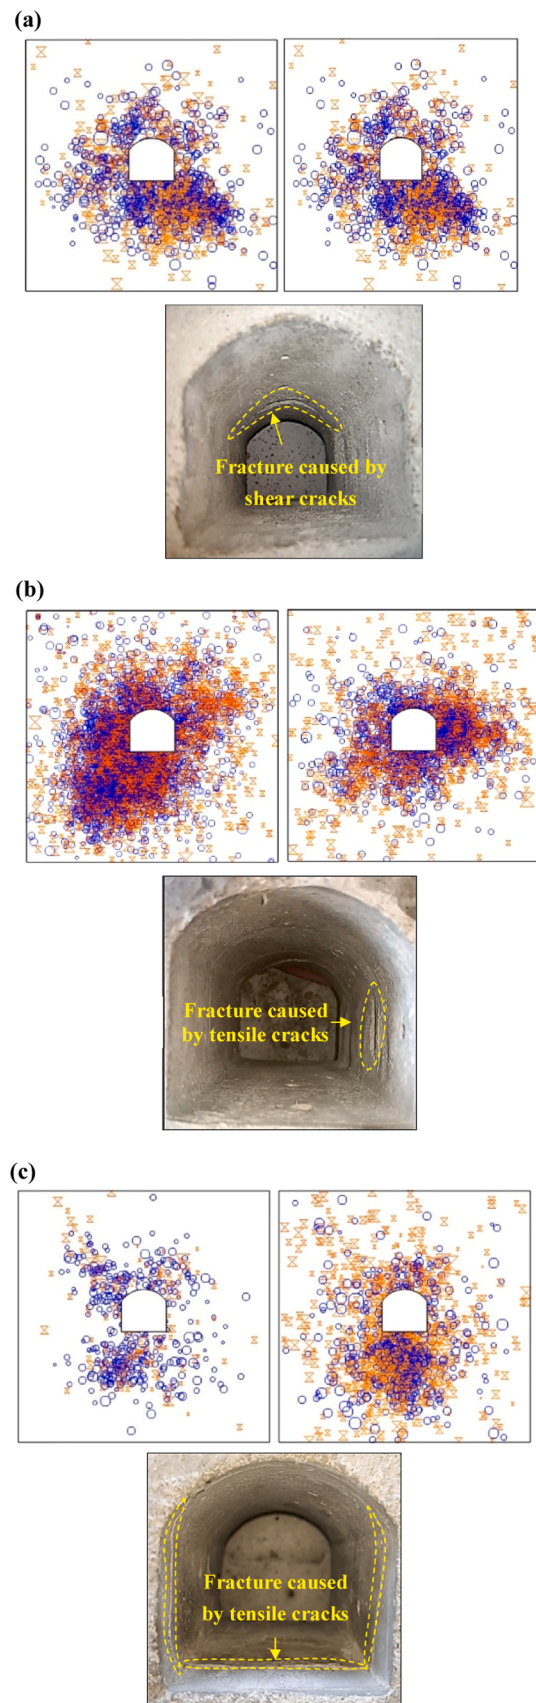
Failure mechanism of tunnel under different blasting disturbance directions: (a) Roof; (b) Right sidewall; and (c) Floor.
